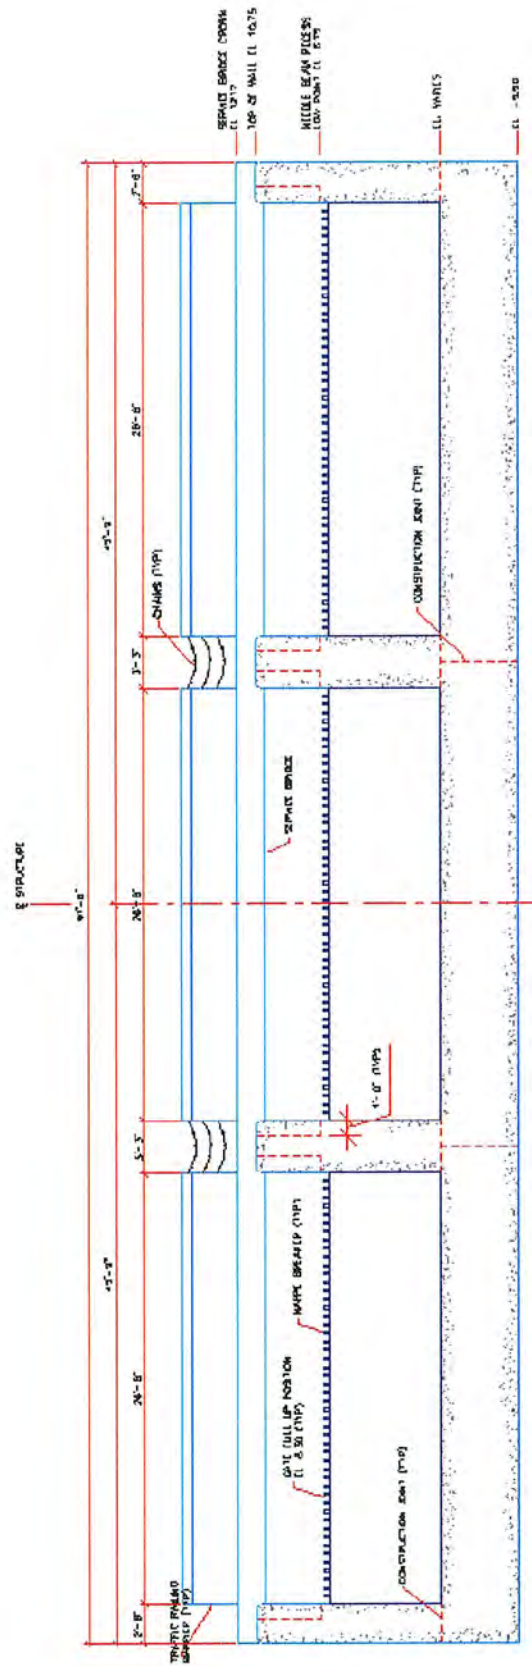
Proposed GG-2 Cross Section (Elevation in ft NGVD)
